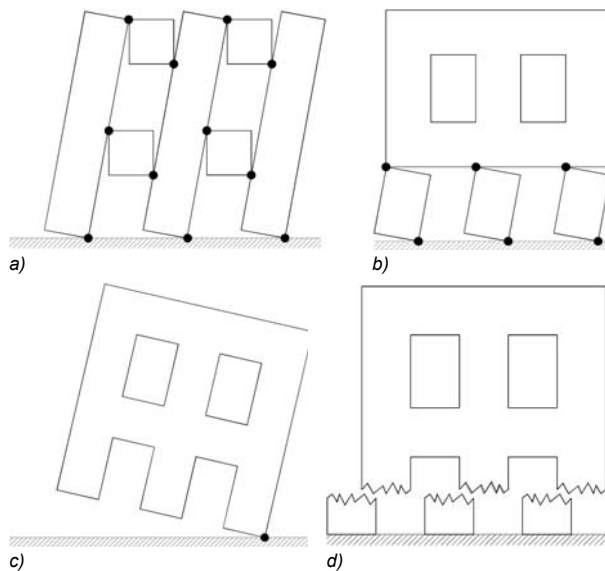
Considered collapse mechanisms: a) global mechanism, b) floor mechanism, c) overturning mechanism, d) shear failure mechanism
